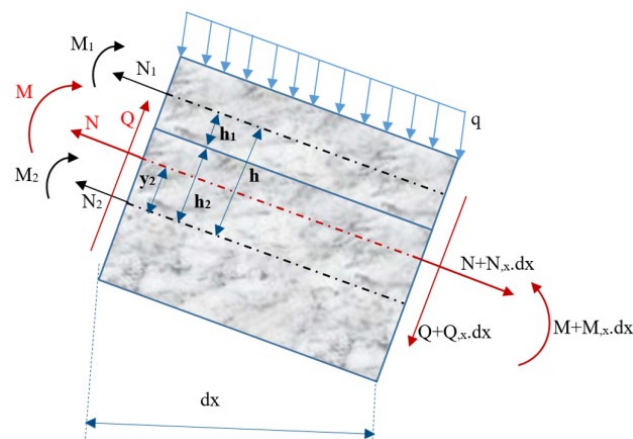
Internal forces acting on an infinitesimal element of the composite beam under bending
